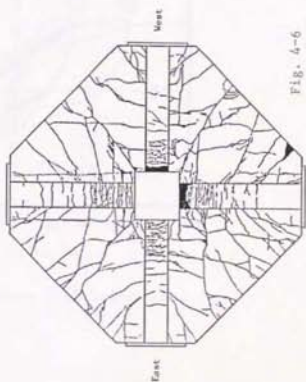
Crack Patterns after Test of Specimen KI
